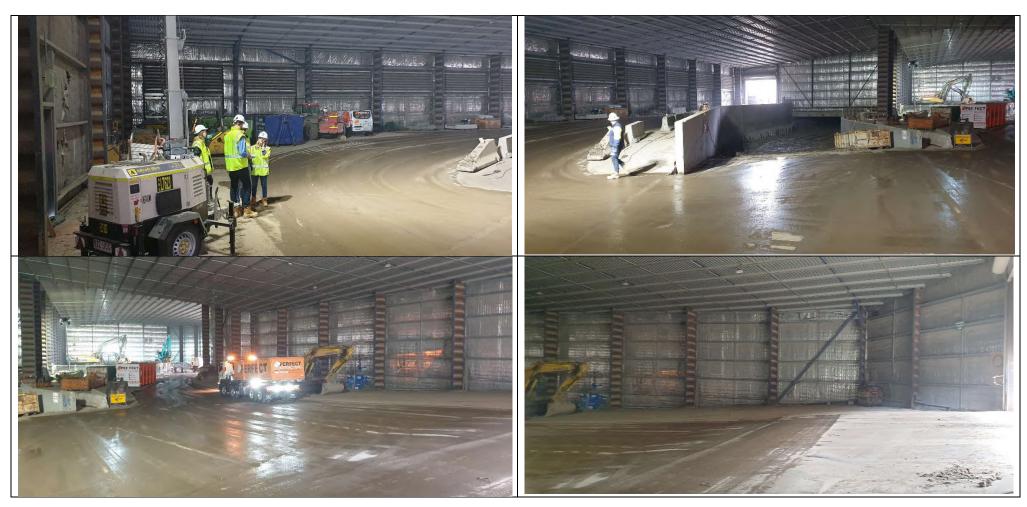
Backfilling tunnel ramp and demobilisation of work area
